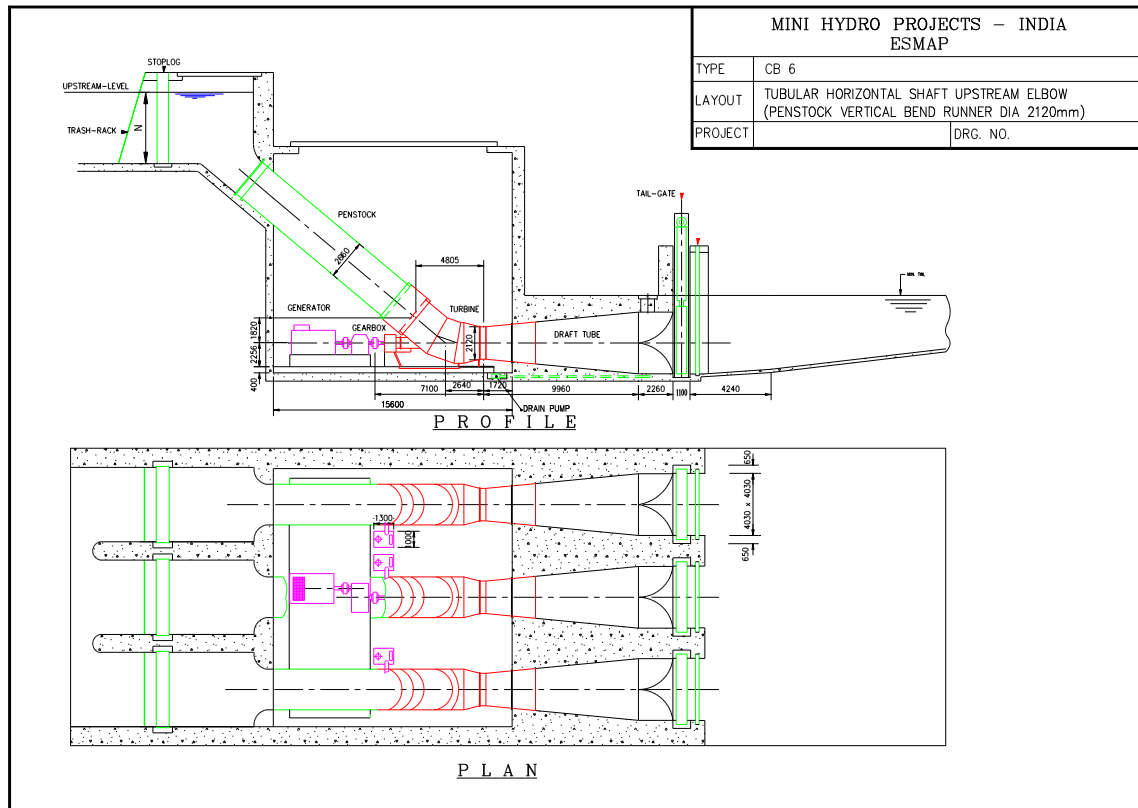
Plan and Profile of Upstream Elbow type Turbine
